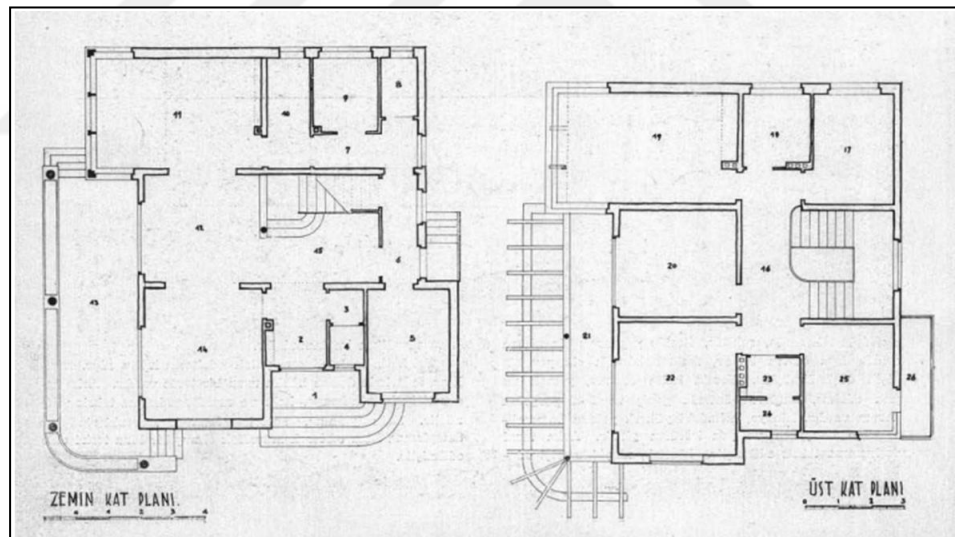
Floor plans of a house in Anadolu Hisari [72]
